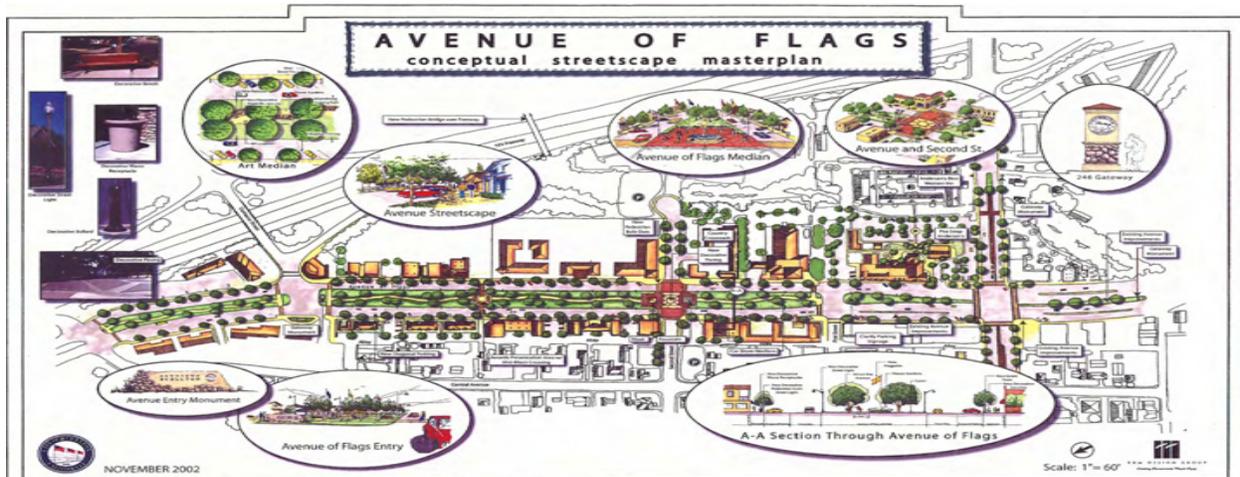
Conceptual Master plan from the Buellton City Design Plan. (Avenue UDP, 2002)
